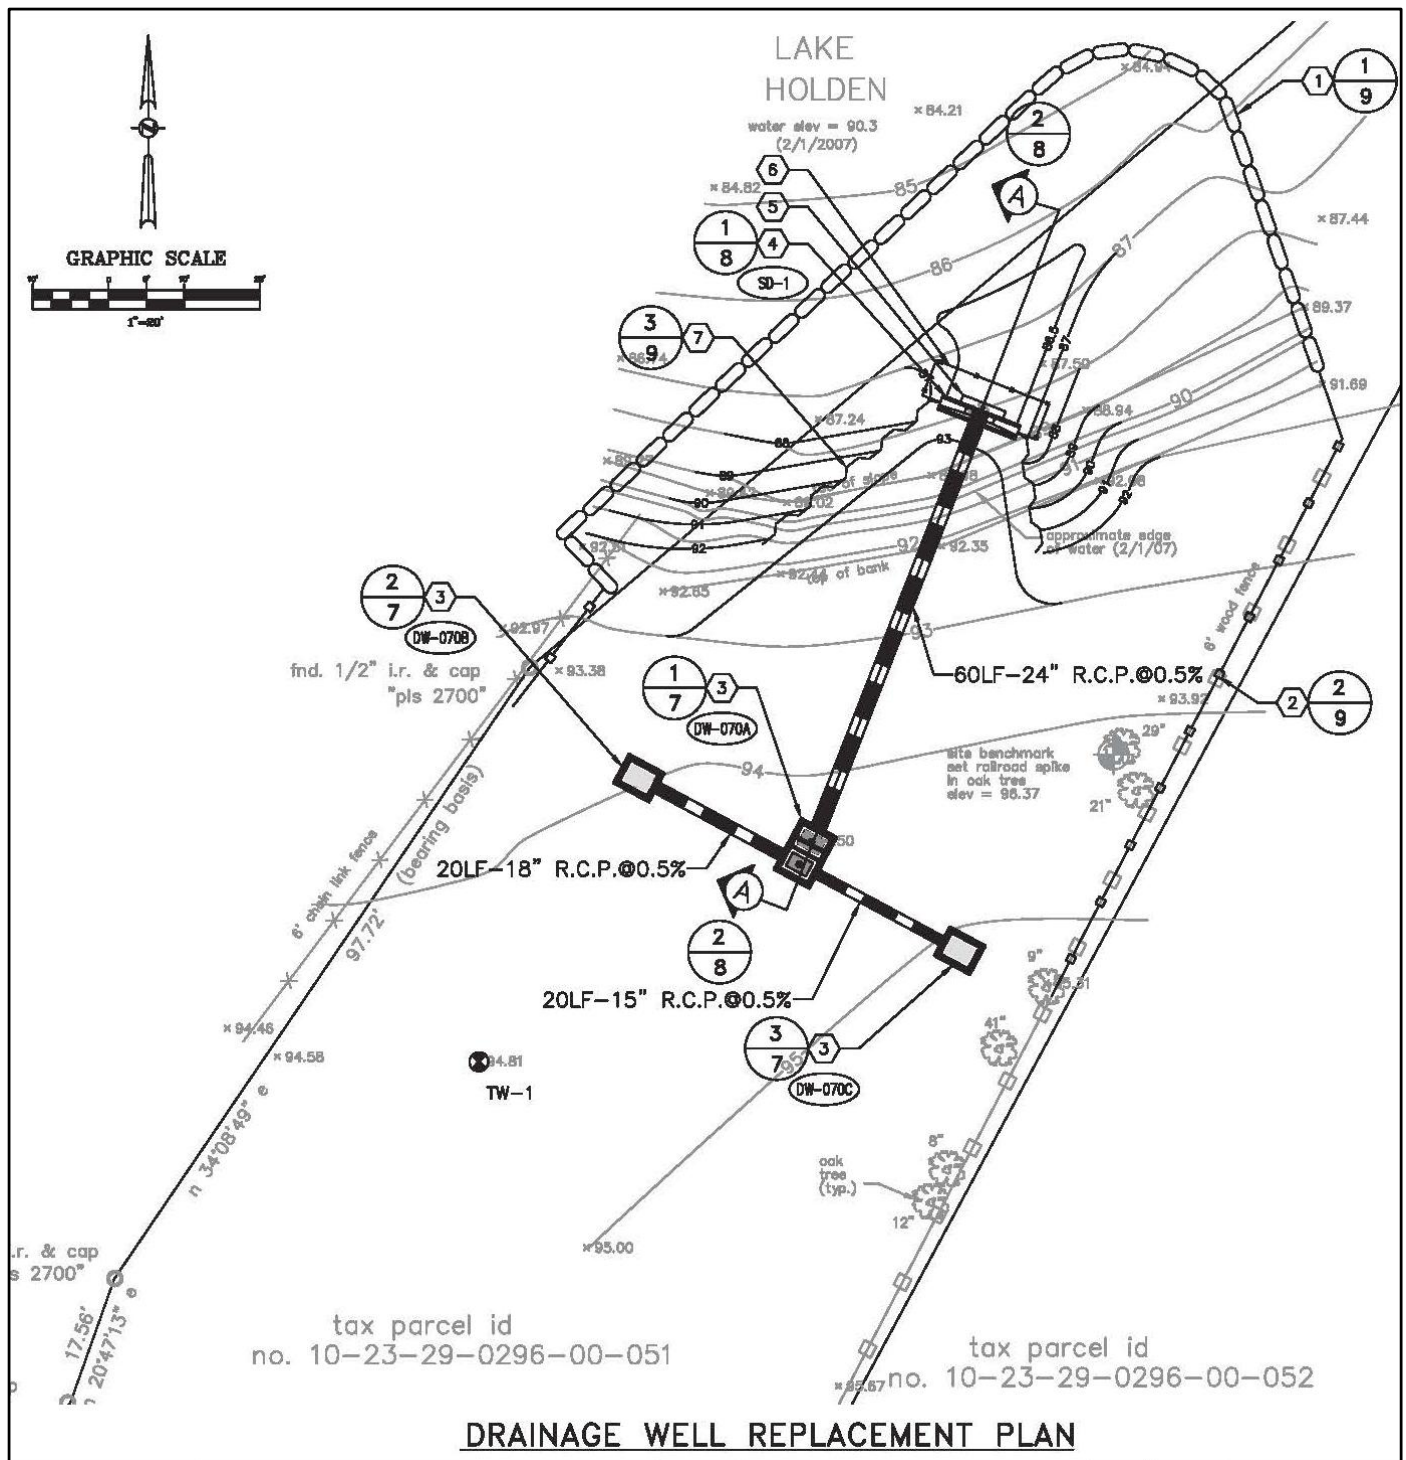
Overview of Drainage Well DW-70 Location and Lake Connection (Devo Engineering, 2010).
